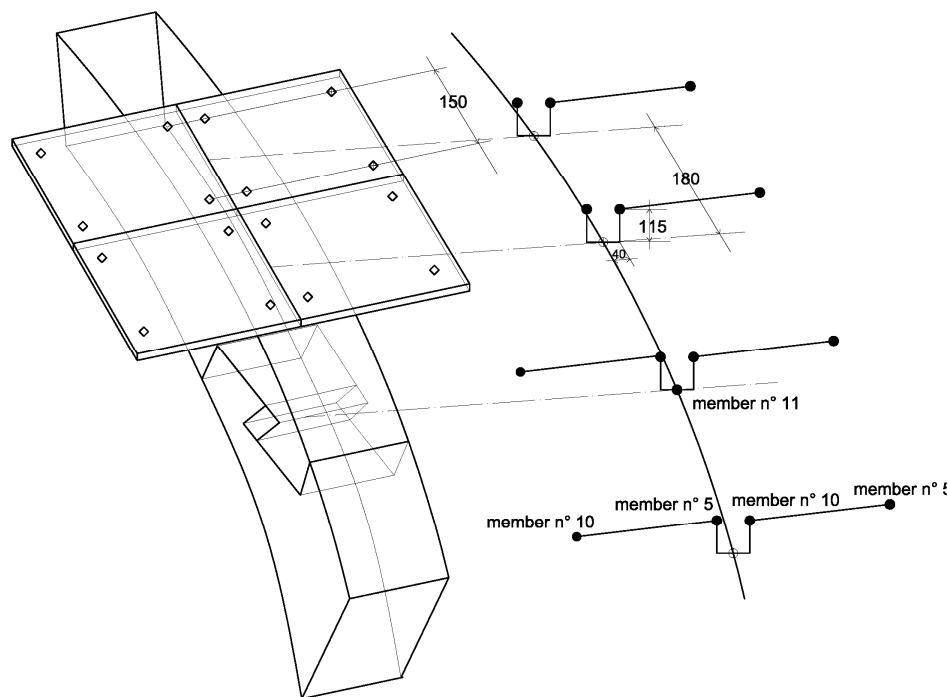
Scheme of the ribs + planking: *Jupiter joint* & nailed connection
